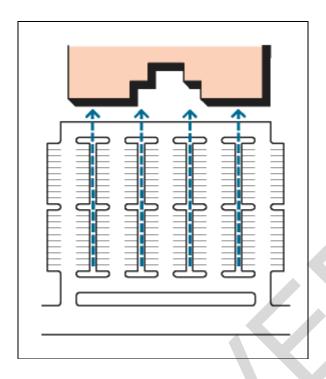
Orient Parking Bays Perpendicular to Facility
